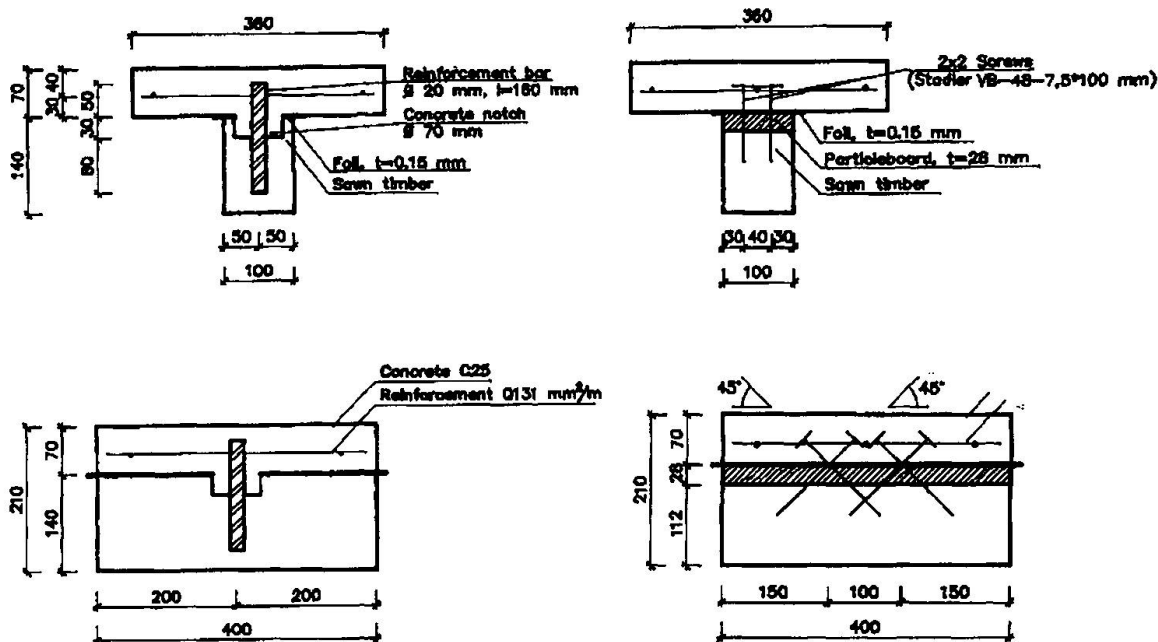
Two fastener types: reinforcement bar with concrete dowel and screws at 45°.
